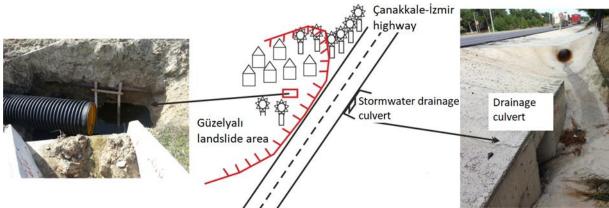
Stormwater drainage culvert thought to have affected the Güzelyalı landslide (UTM: 445325 E, 4434504 N).
